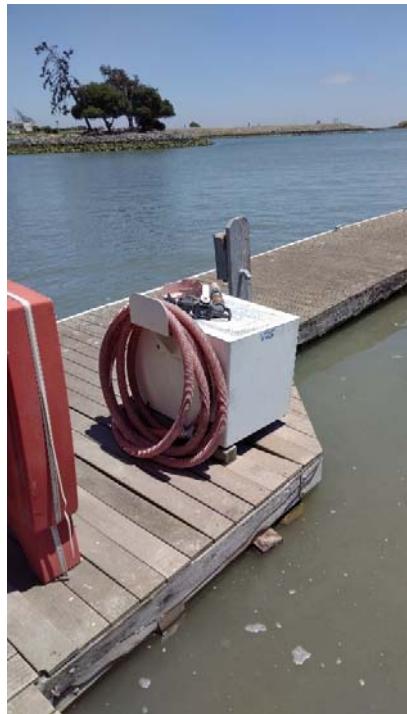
Sewage Pump on Refueling Dock (typical of 2)
